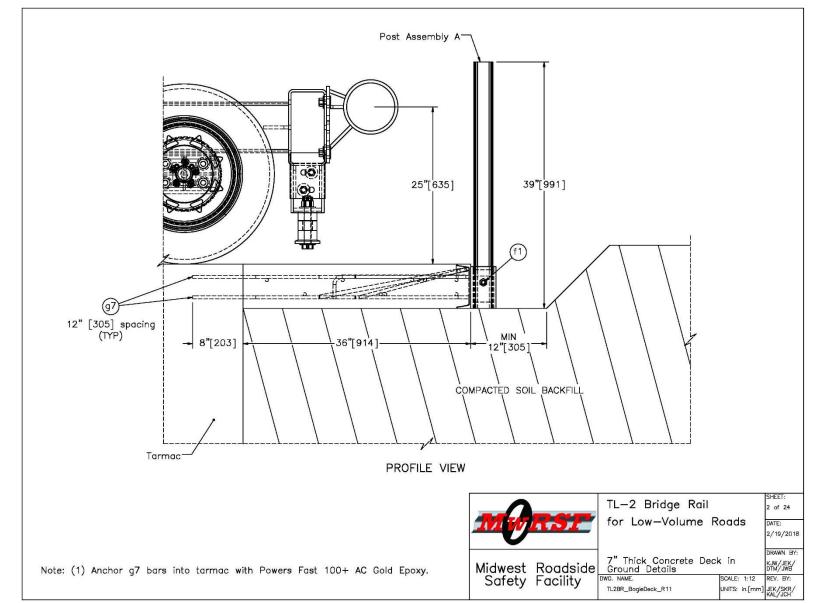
Bogie Testing Matrix and Setup, 7-in. Thick Concrete Deck in Ground Details
